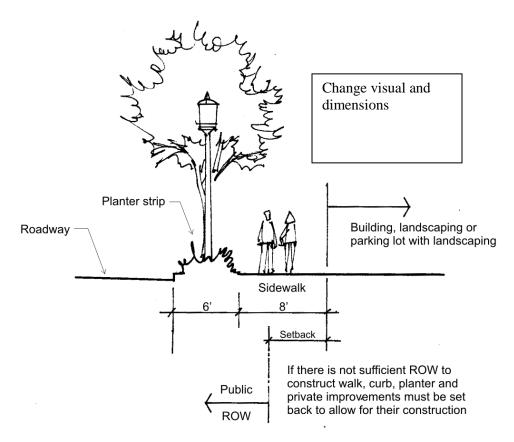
Illustration of setback to allow construction of a sidewalk and planting strip
